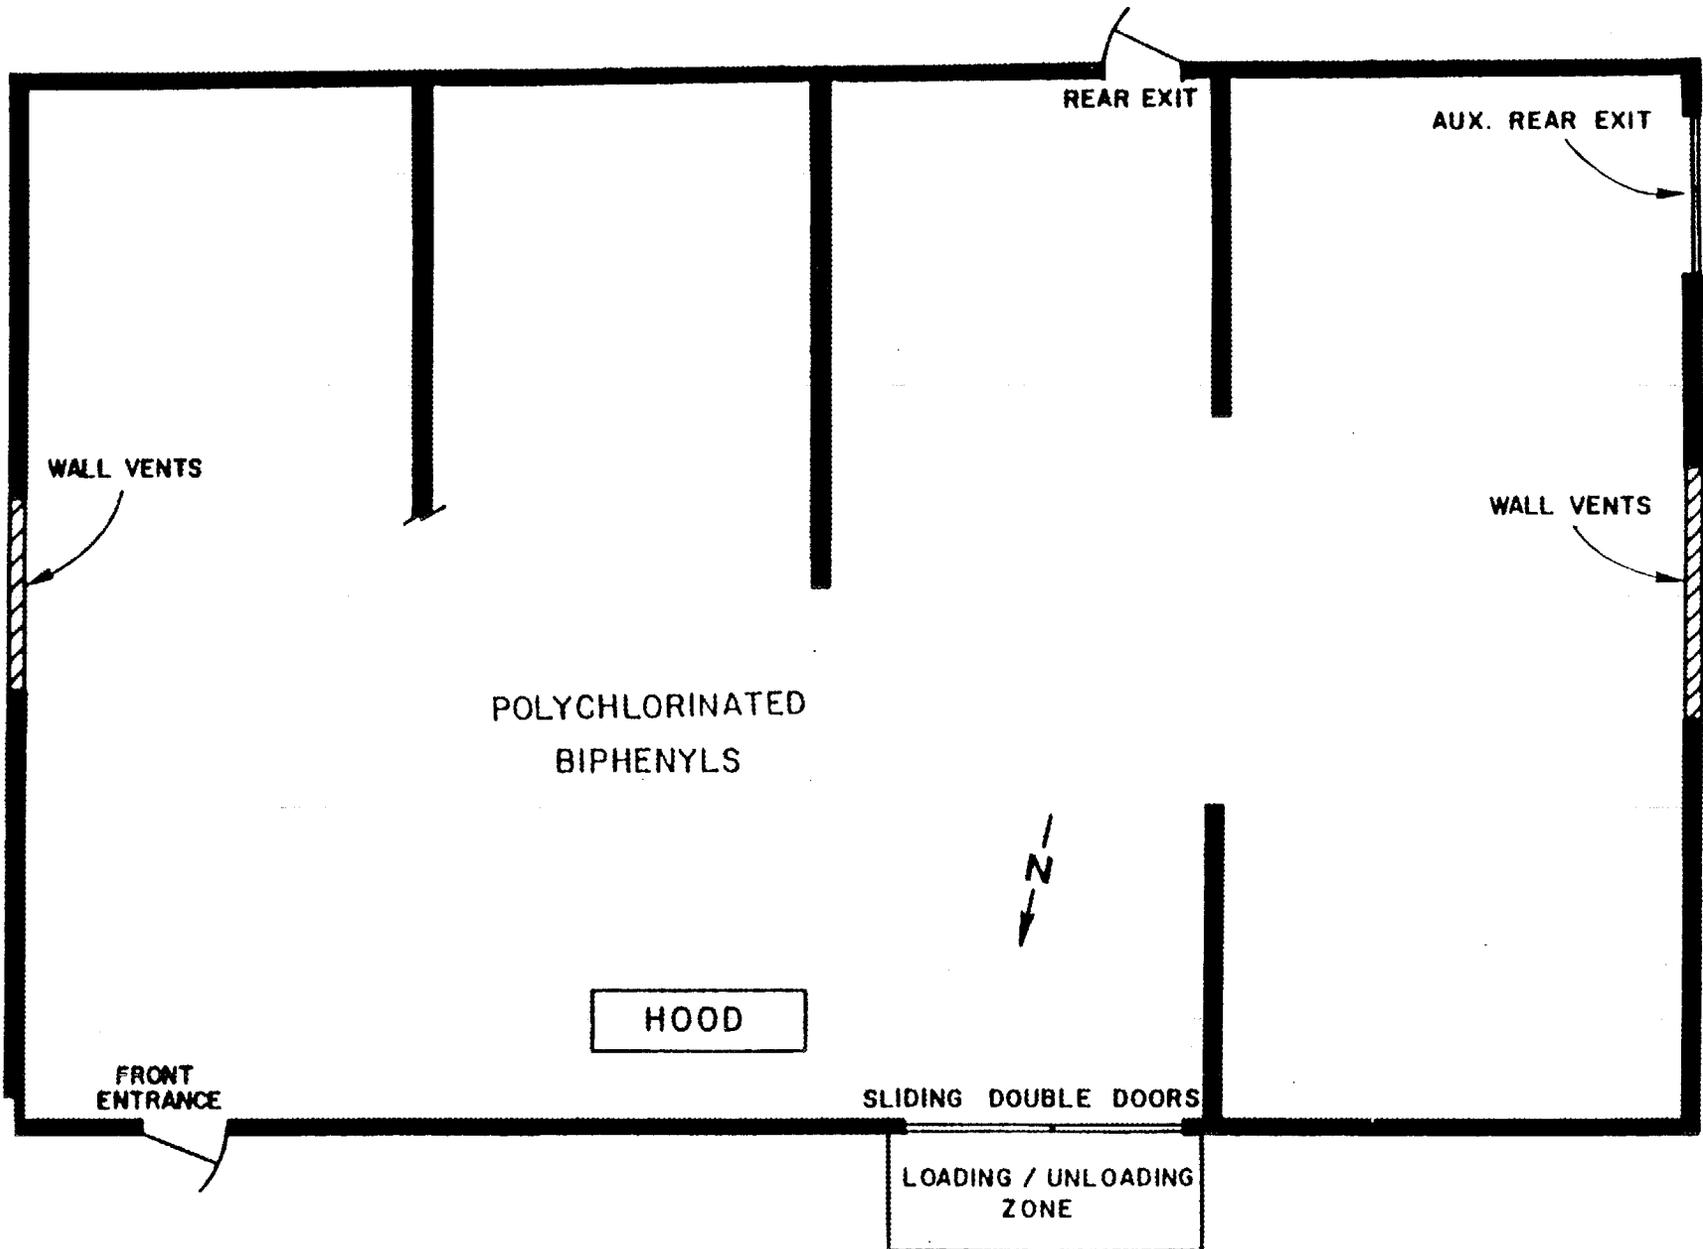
Layout of Bulding 7507, Hazardous Waste Storage Facility.
